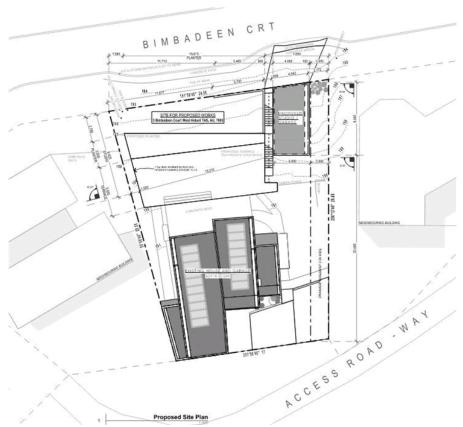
Applicant proposal plan (Crump Architecture, 2022)
